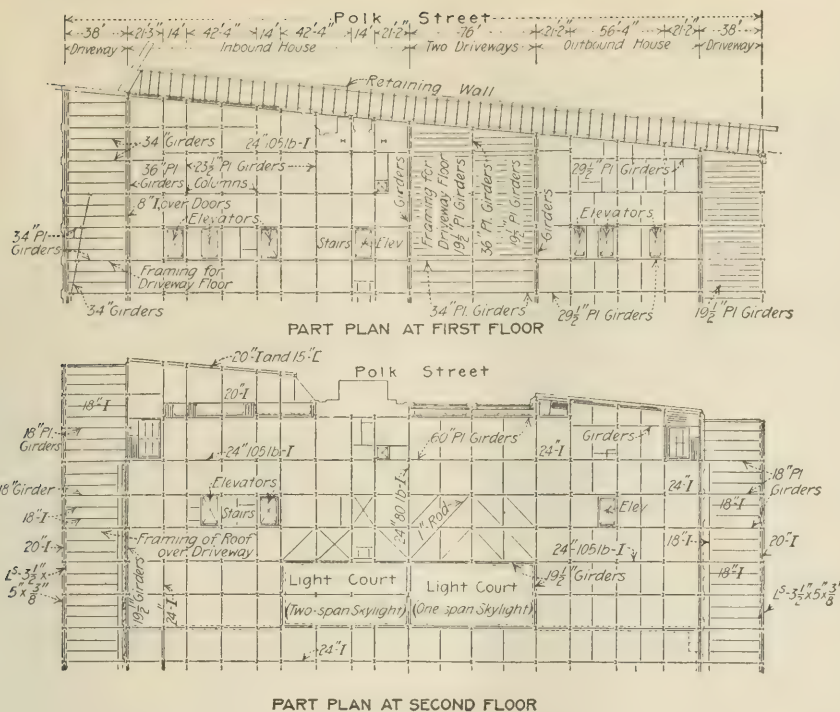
STEEL FRAMING PLANS OF FREIGHT TERMINAL
